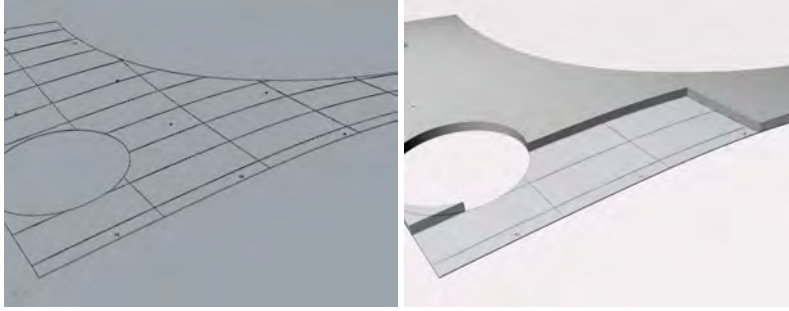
Rolex Learning Centre, EPFL, Lausanne - Alternative solution with stay-in-place concrete planks as formwork (left) with cast in-situ top layer (right); shown is a possible panelisation in transportable units of the curved precast formwork planks; each element has a size of around $8 \times 3.4 \text{ m}^2$ (RS, after Moiralis, 2013).
